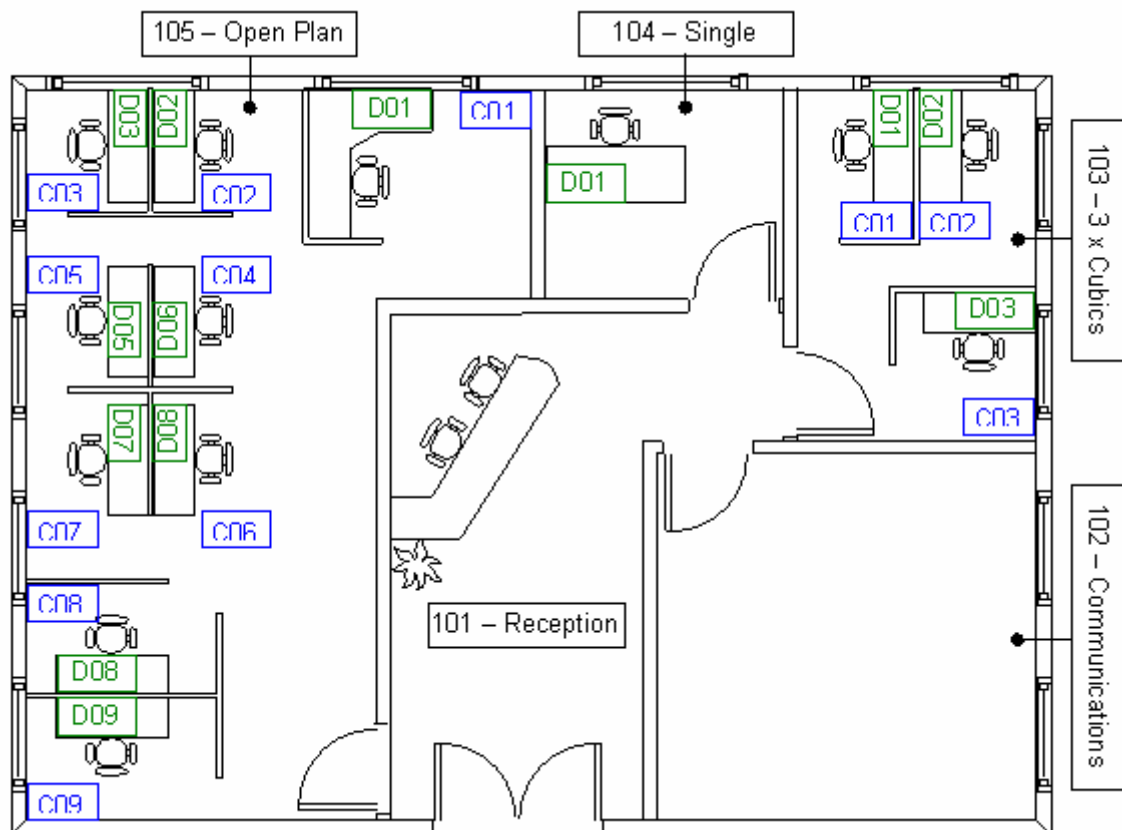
Example of a Cad Drawing for one floor in a Building Window
